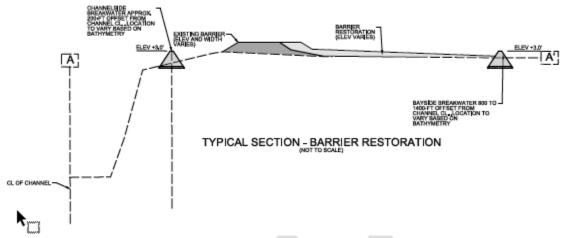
Typical Section for Beneficial Use Placement Area (Existing Barrier)
